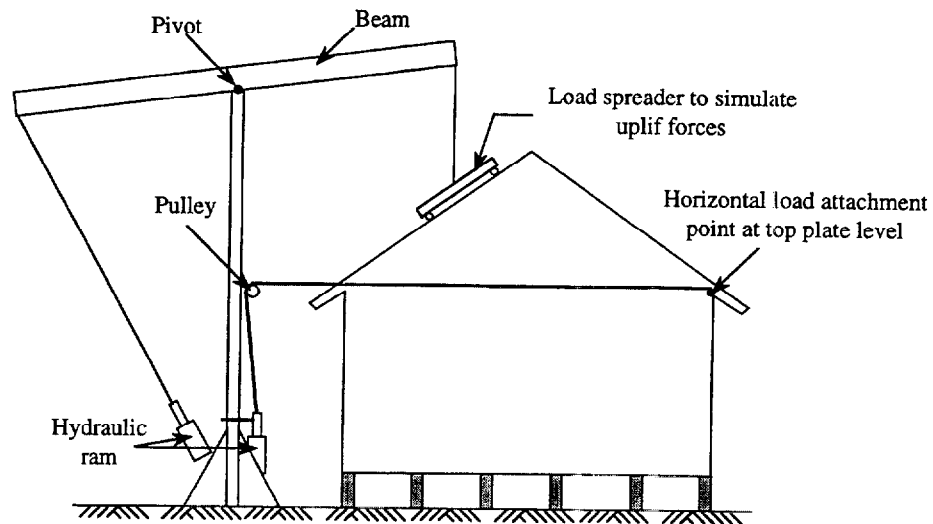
Schematic of Test Setup for Horizontal Load at the Top Plate and Vertical Load (after Boughton and Reardon, 1982).
